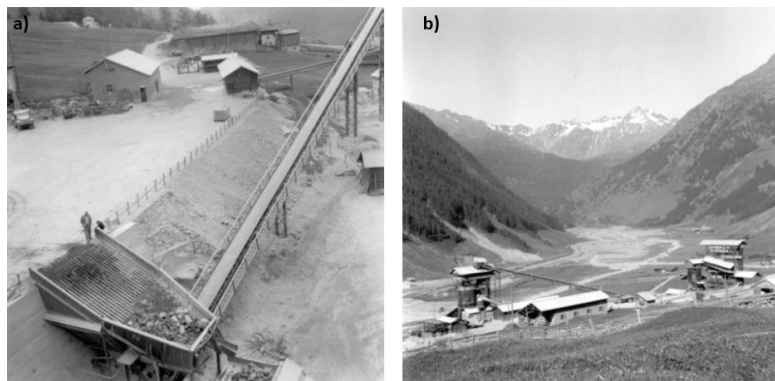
Sieving system a) and the mixing plant b) for obtaining the core soil of Vernago Dam (Japelli and Silvestri, 2005)
